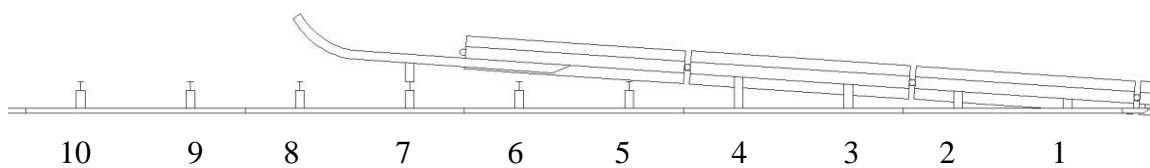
MGS with Blockout to Cantilever Beam – Impact Locations
